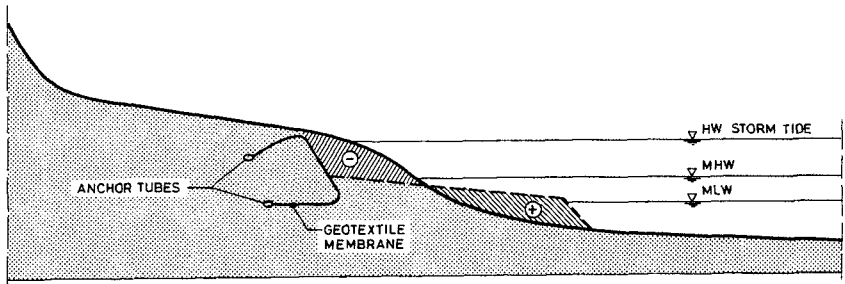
Damage limitation of the dry beach and dune by a storm tide with the aid of a geotextile membrane (schematic)
